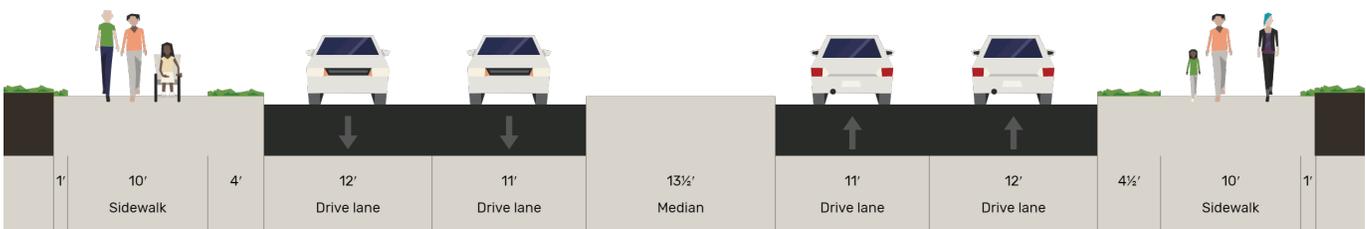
San Pablo Avenue (South) – Alternative 3 General Cross Section (Facing North)
